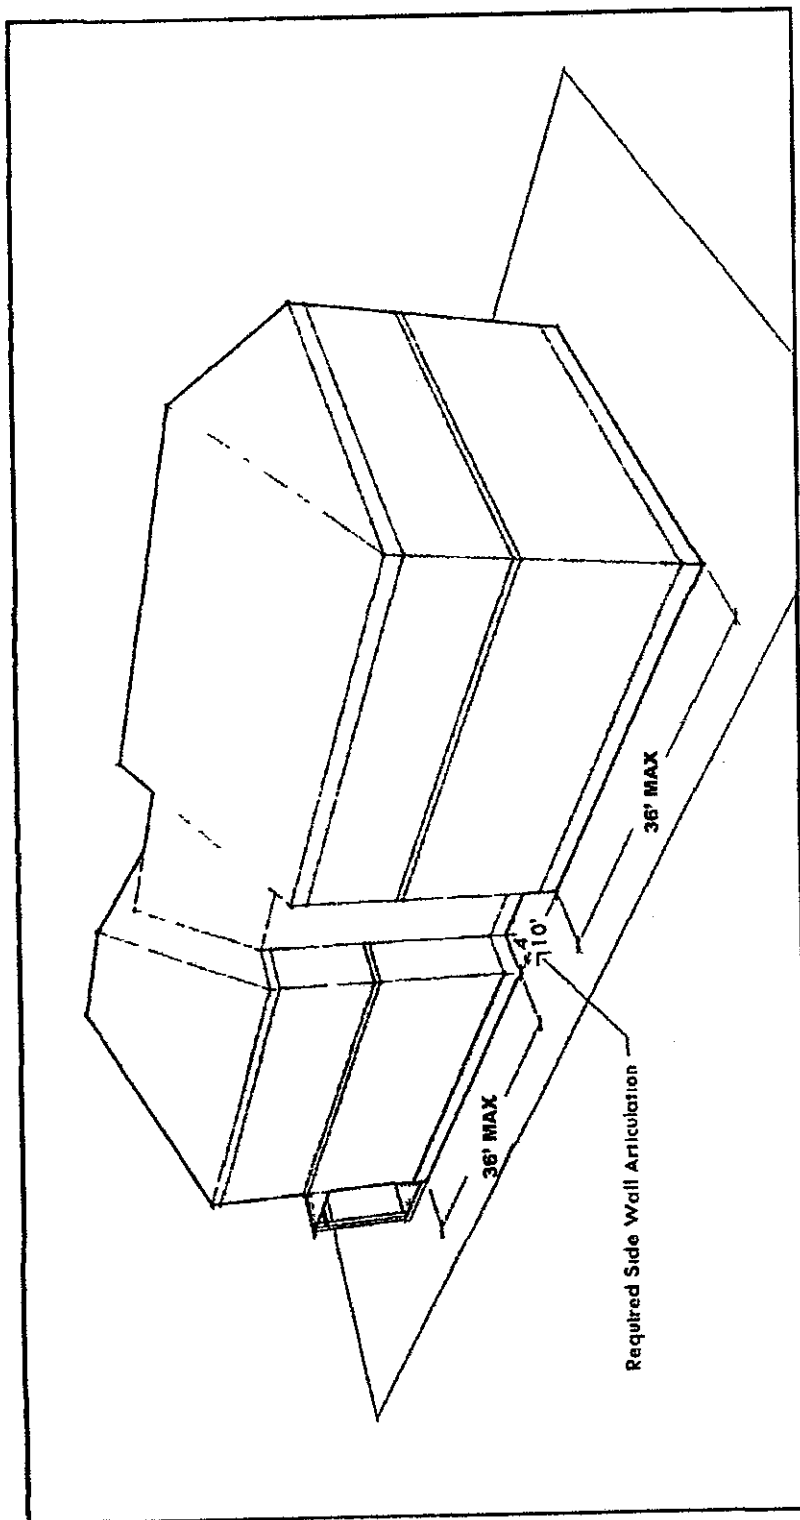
Side Wall Articulation (Existing Side Wall Exceeds 36 Feet)
